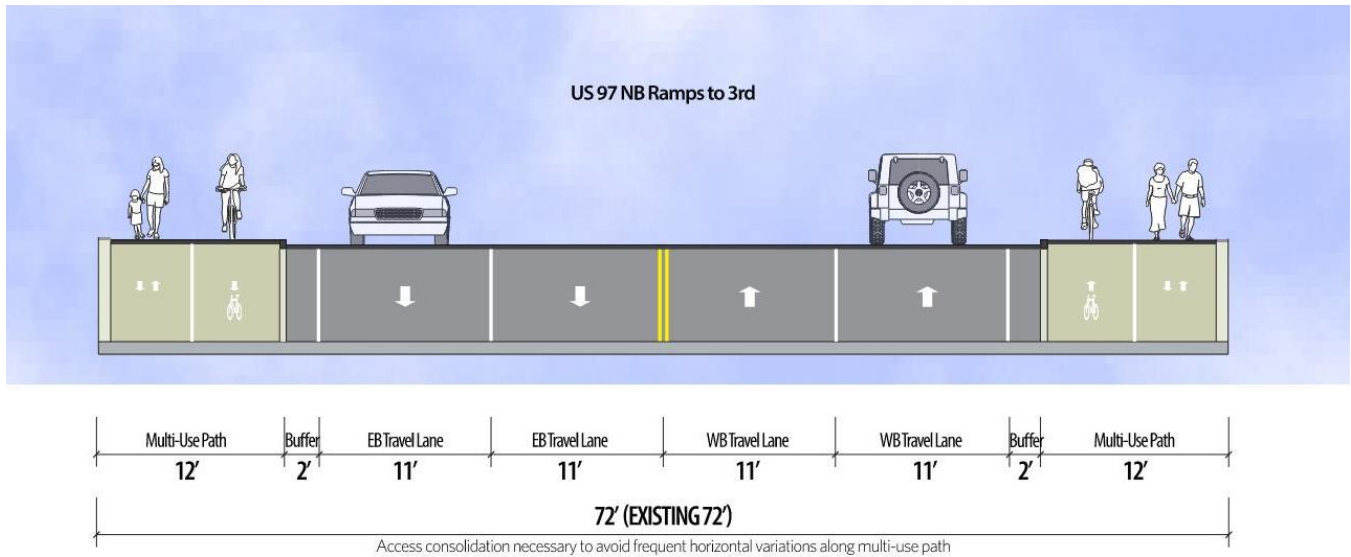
POTENTIAL LONG-TERM REED MARKET ROAD CROSS SECTION (US 97 NORTHBOUND RAMPS TO 3RD STREET)
